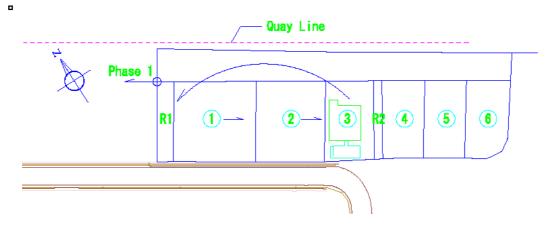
(2) Alternative land section plan for Providence fishing port
